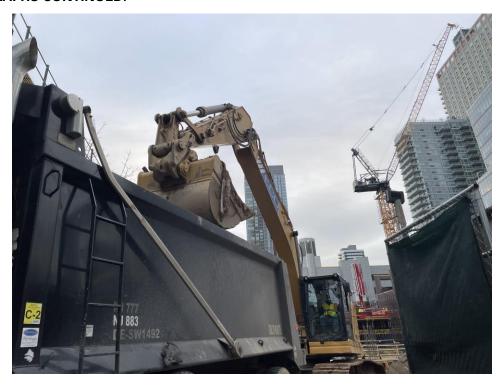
ECD loading a truck for off-site disposal in the southwestern part of the site (facing north).
